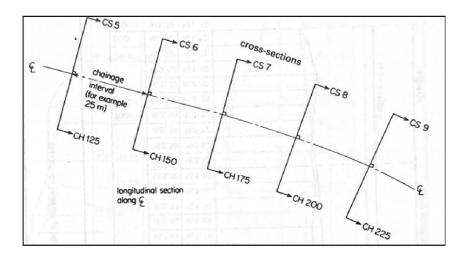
Long section and Cross-section layout Sources; Surveying for Engineers J.Uren & W.F.Price 3rd edition
